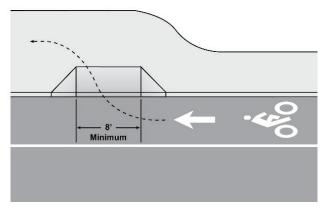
Ramp allows bicycle to access sidewalk on bridge
